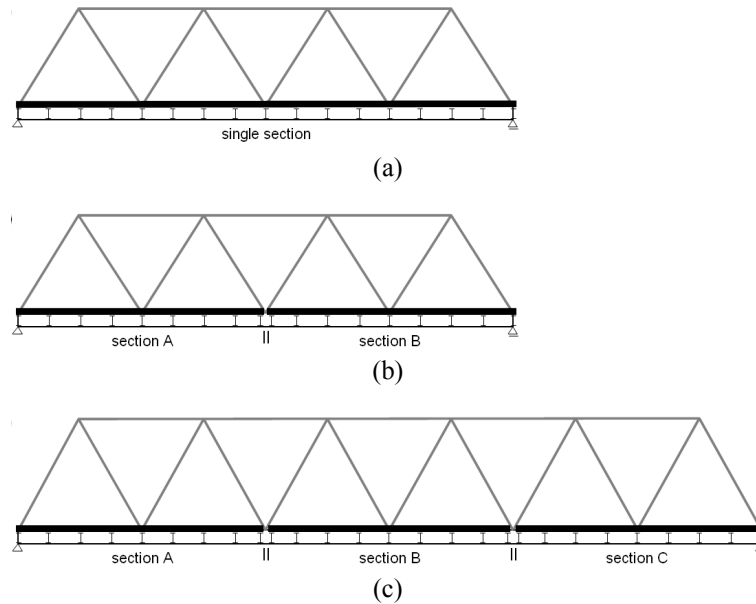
Division of deck slab (darkened) into sections (symbols || mark expansion joints in concrete slab): (a) no expansion joints; (b) one expansion joint; (c) two expansion joints
